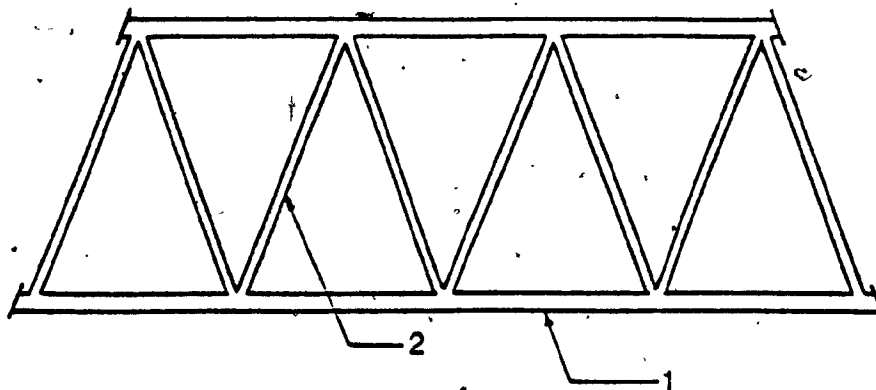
A TYPICAL RING TRUSS MODULE.
